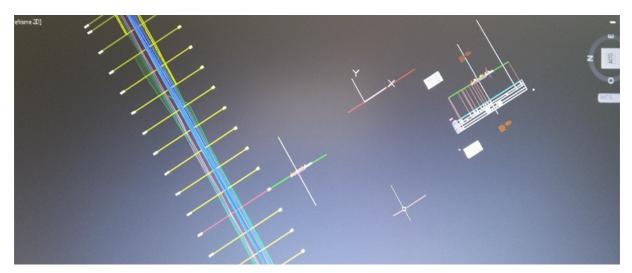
Stretch of the road with indicated the width, roadsides, the location of numbered road cross sections; on the right, one of the road cross sections in 2D imported to be redesigned with different layer for each road component
